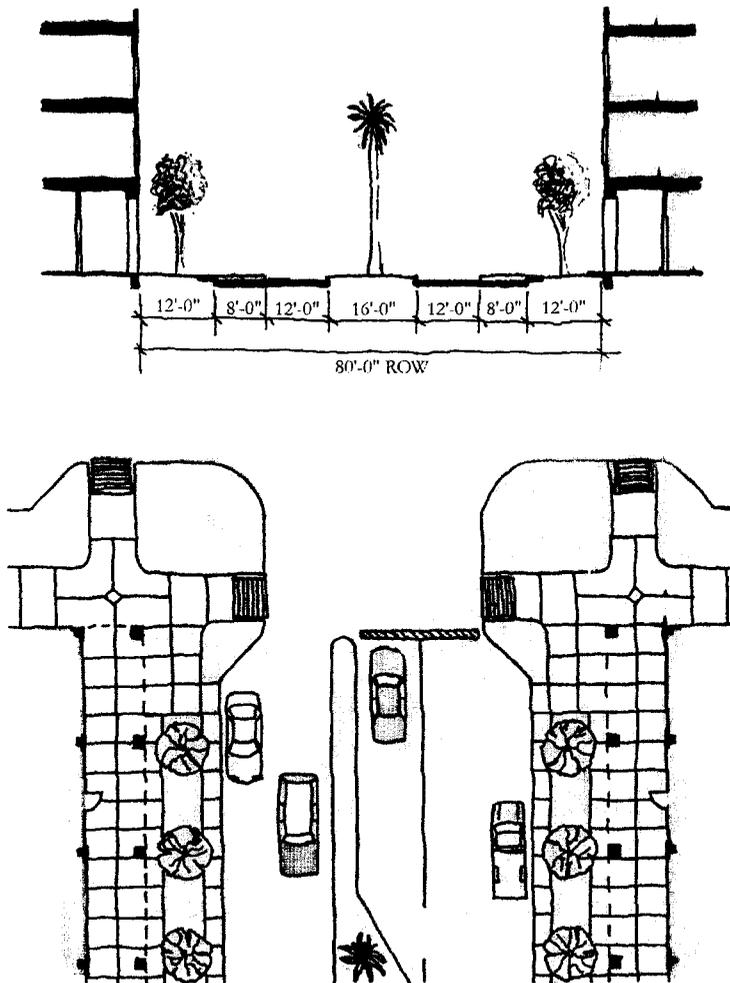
Two Lane Proposed Plan and Profile of Westgate Avenue
